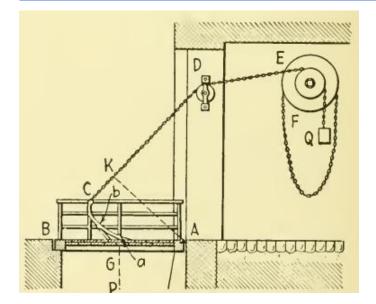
Early modern type bascule bridge (Hovey, 1926)
